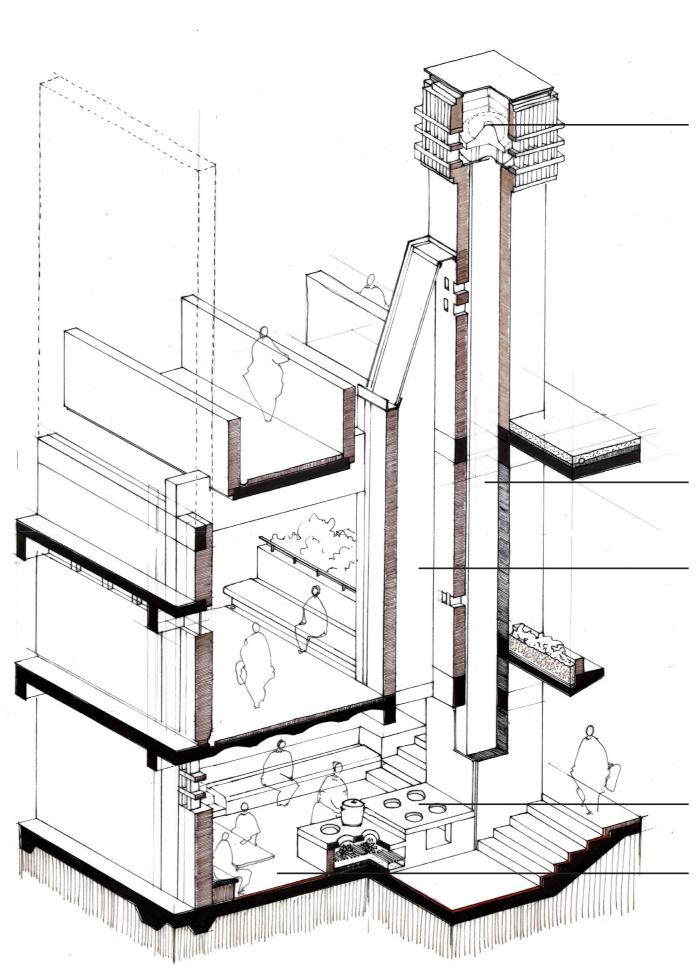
Axonometric section of the cooking space and chimney (Author 2021)
